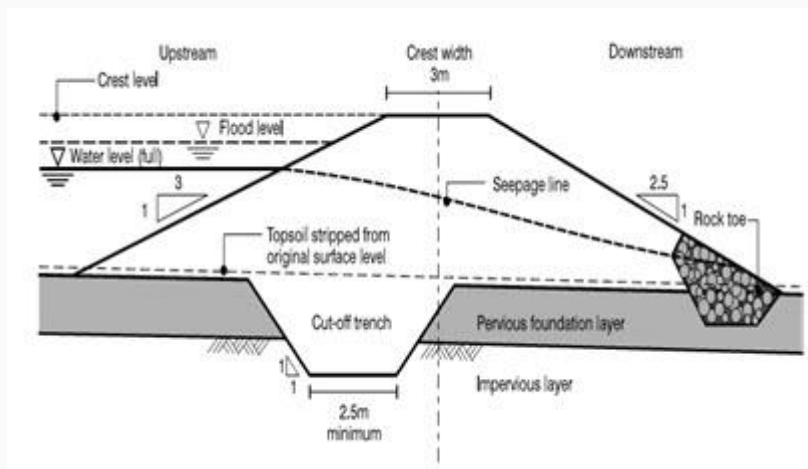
Cross sectional view of earth dam. (Source: Nelson, 1985)
